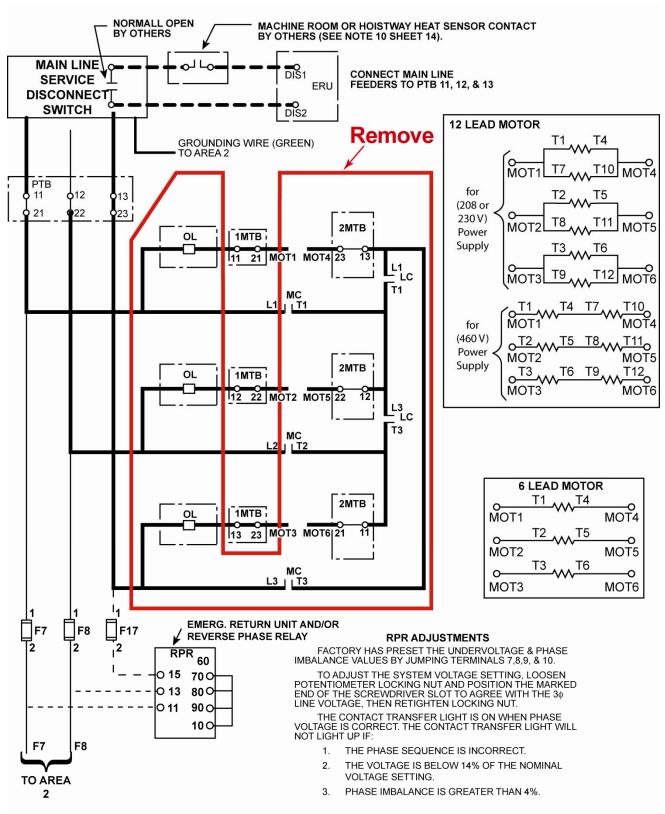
Removal of Wye-Delta Motor Contactors and Overload in Typical '4H' Controller
